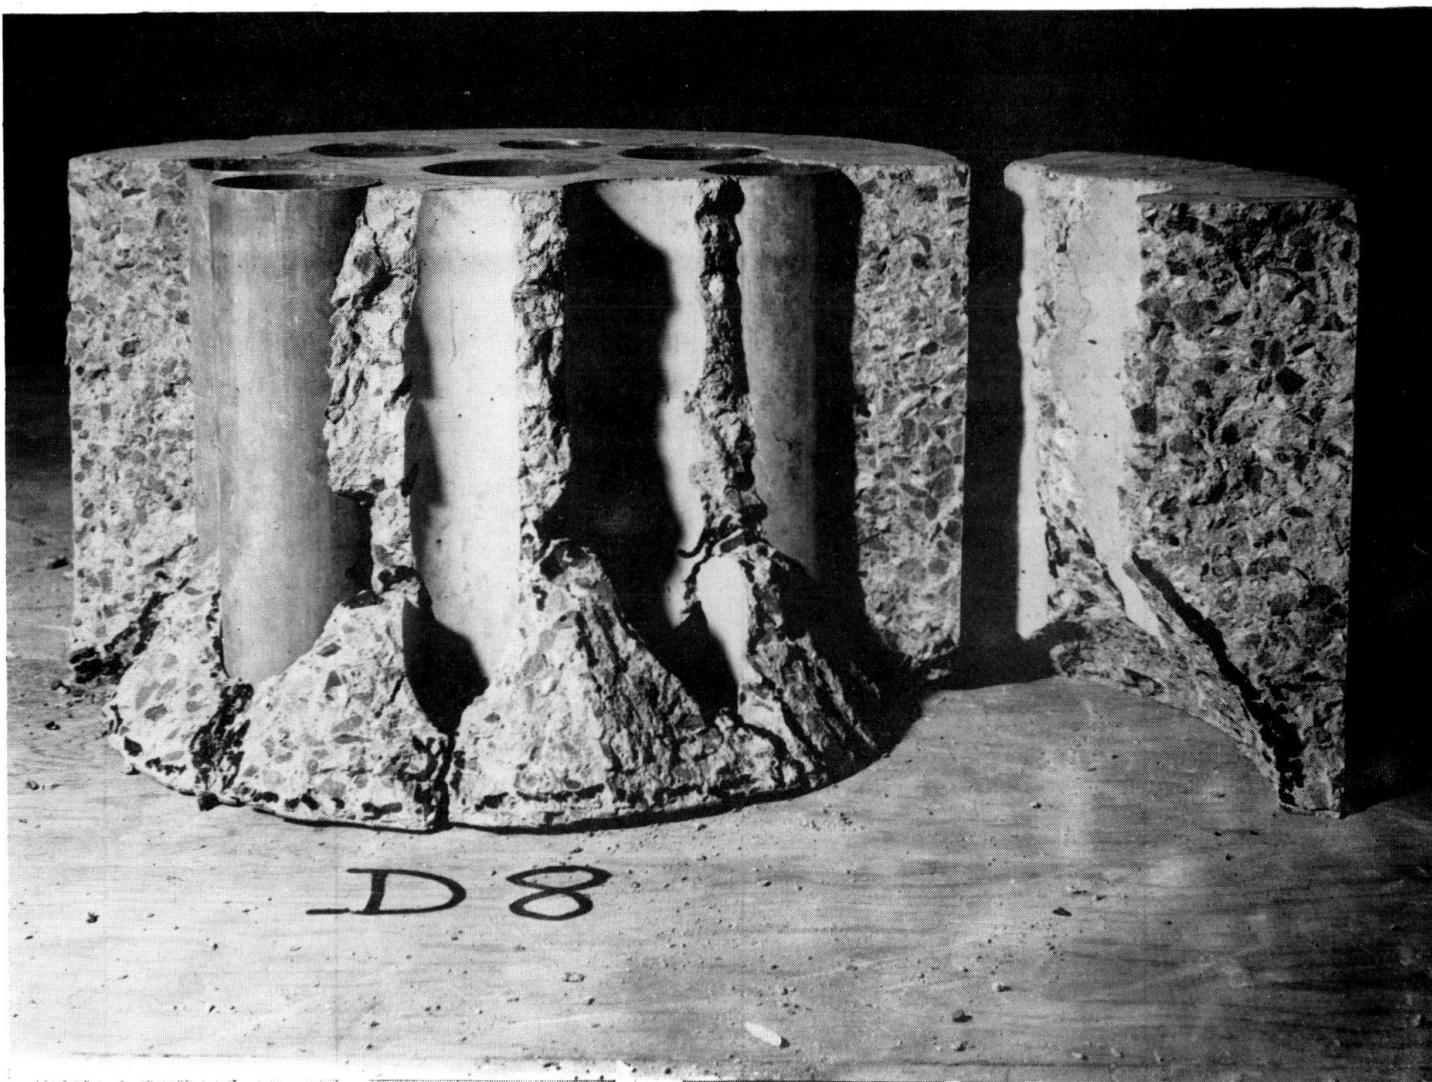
1/10th Scale Model Boiler Closure Showing Failure Planes
